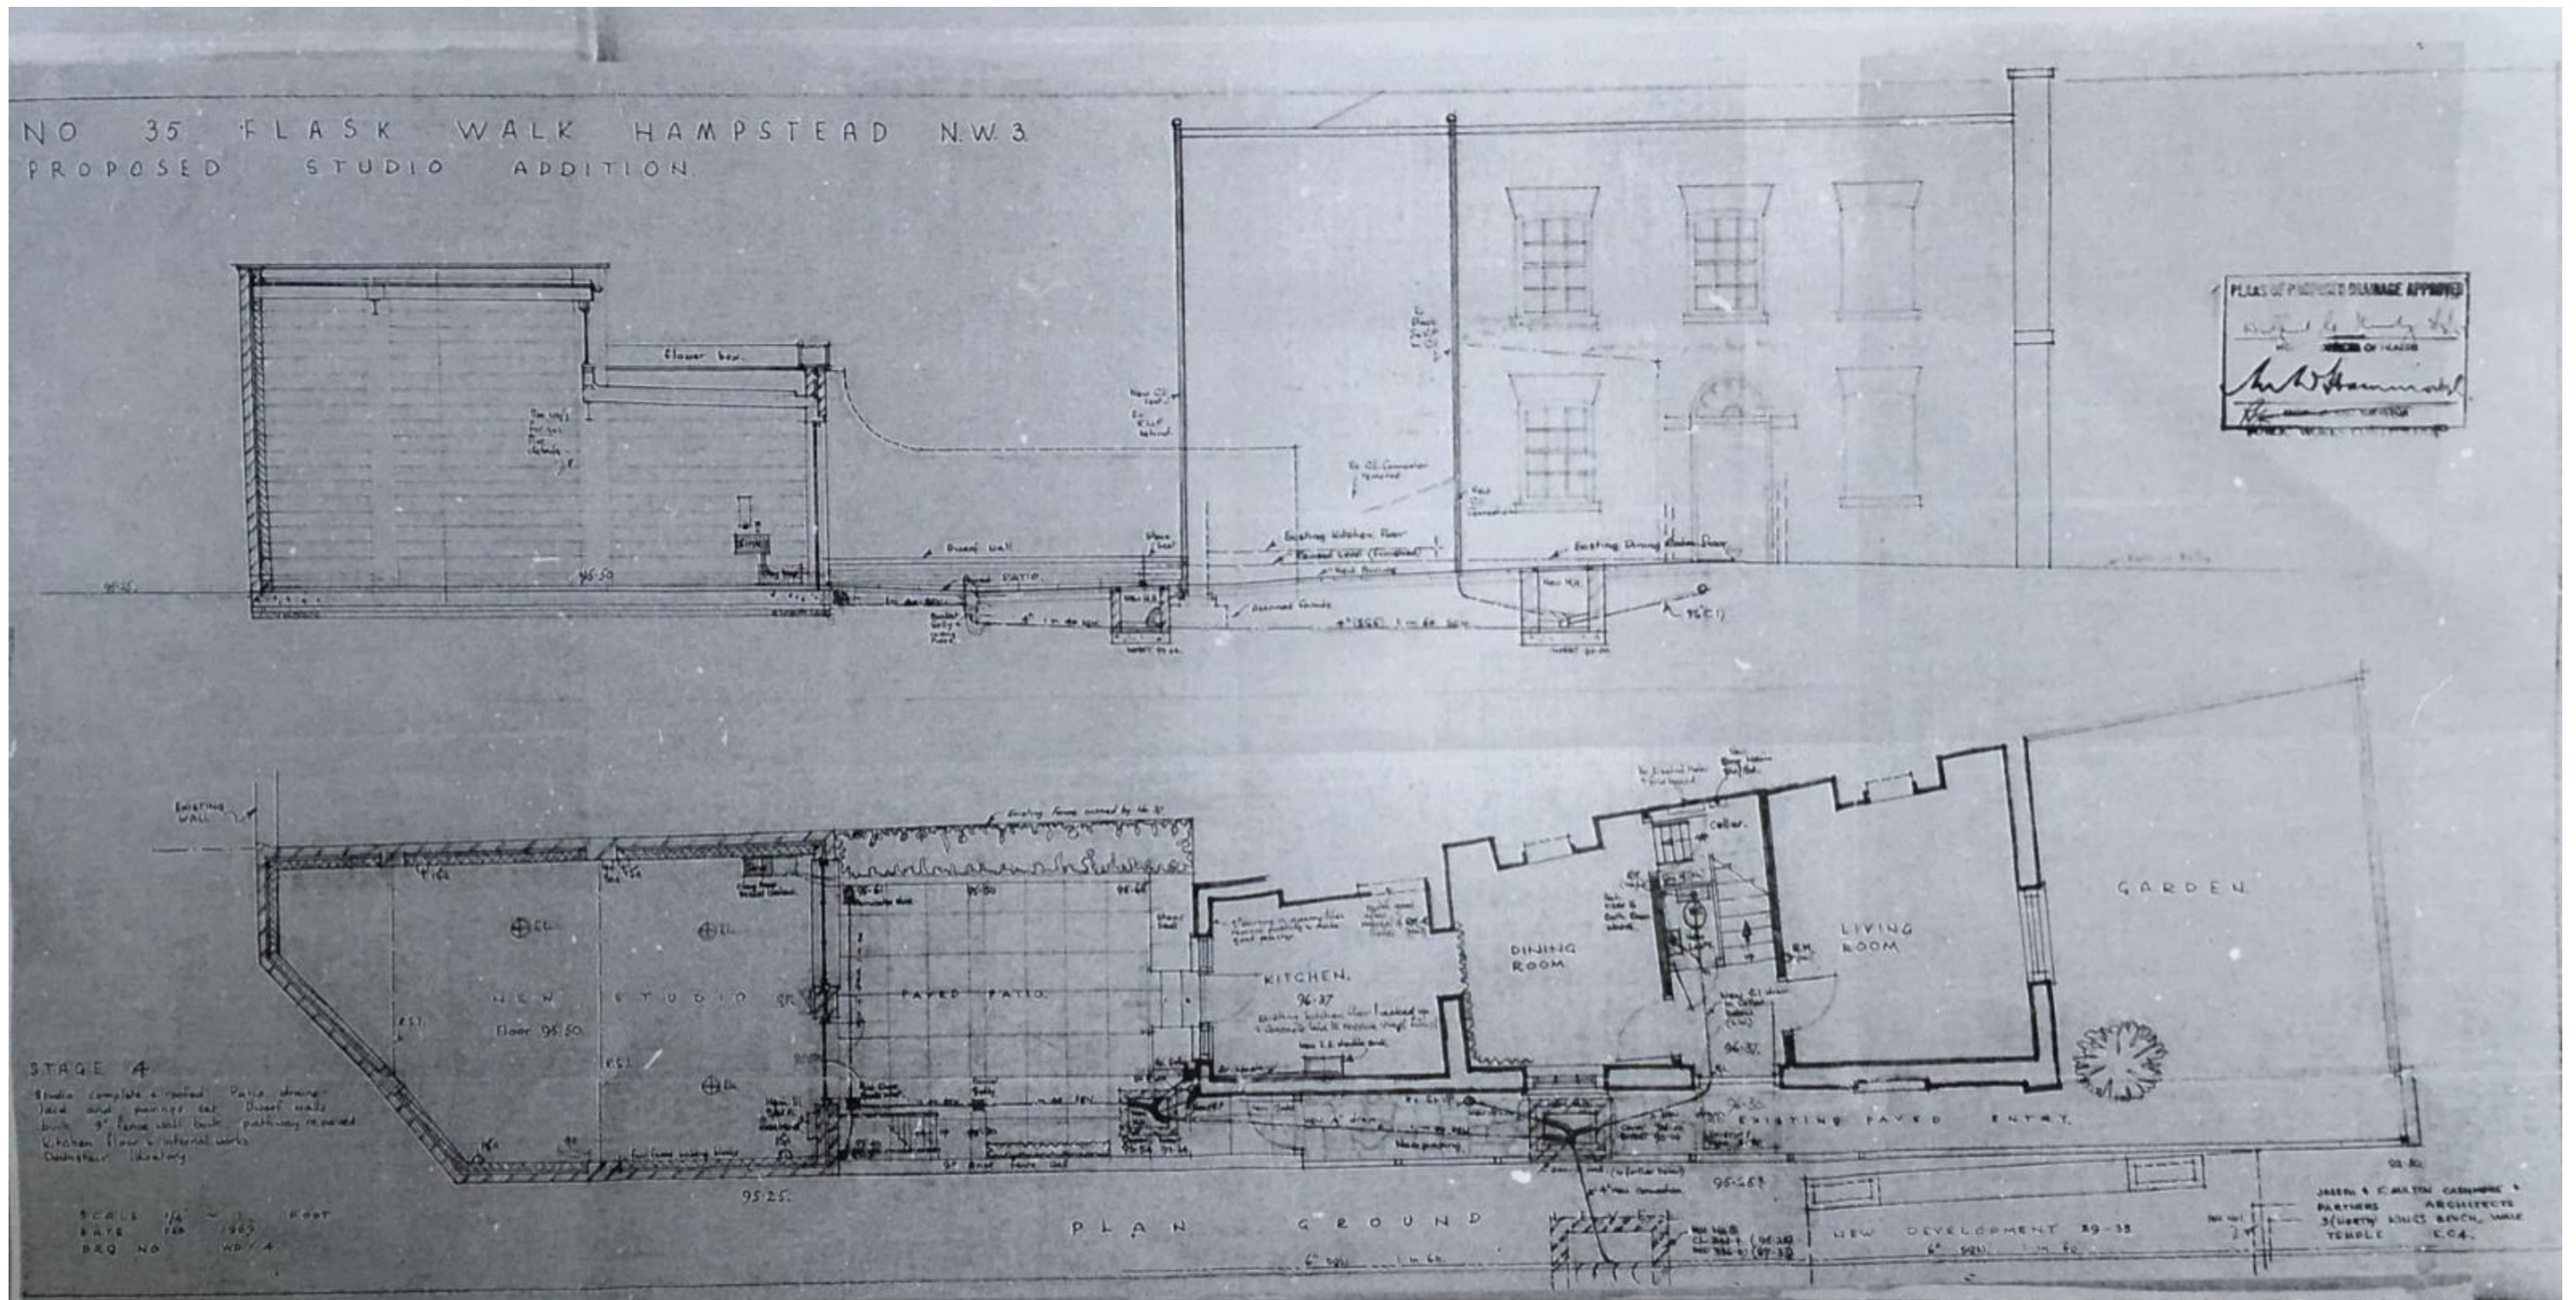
1969 Proposed Plans showing new Artist's studio and internal modifications
